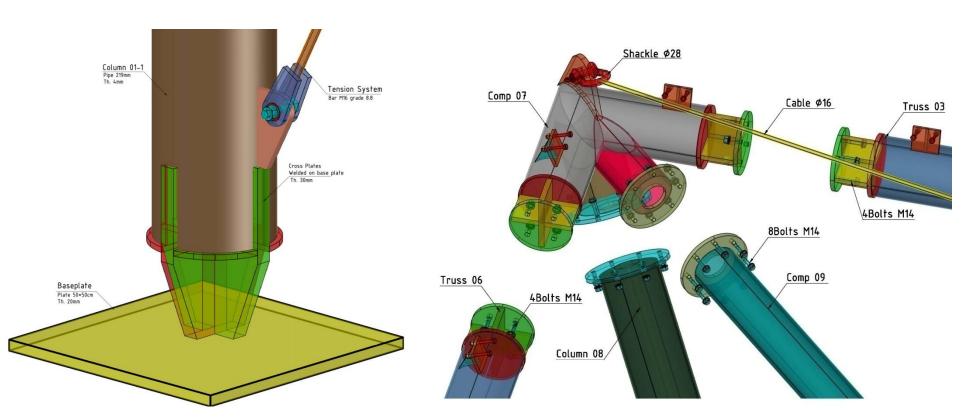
there is a cross plate for columns connection to the base plates ,that is welded inside the pipe grooves and it must be welded on base plates in bottom.
